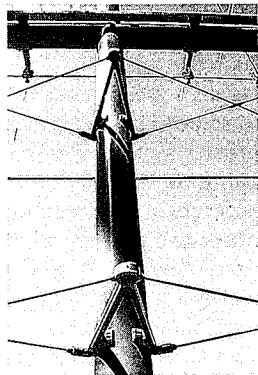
Detail of atrium of head office building of Long-Term Credit Bank of Japan
